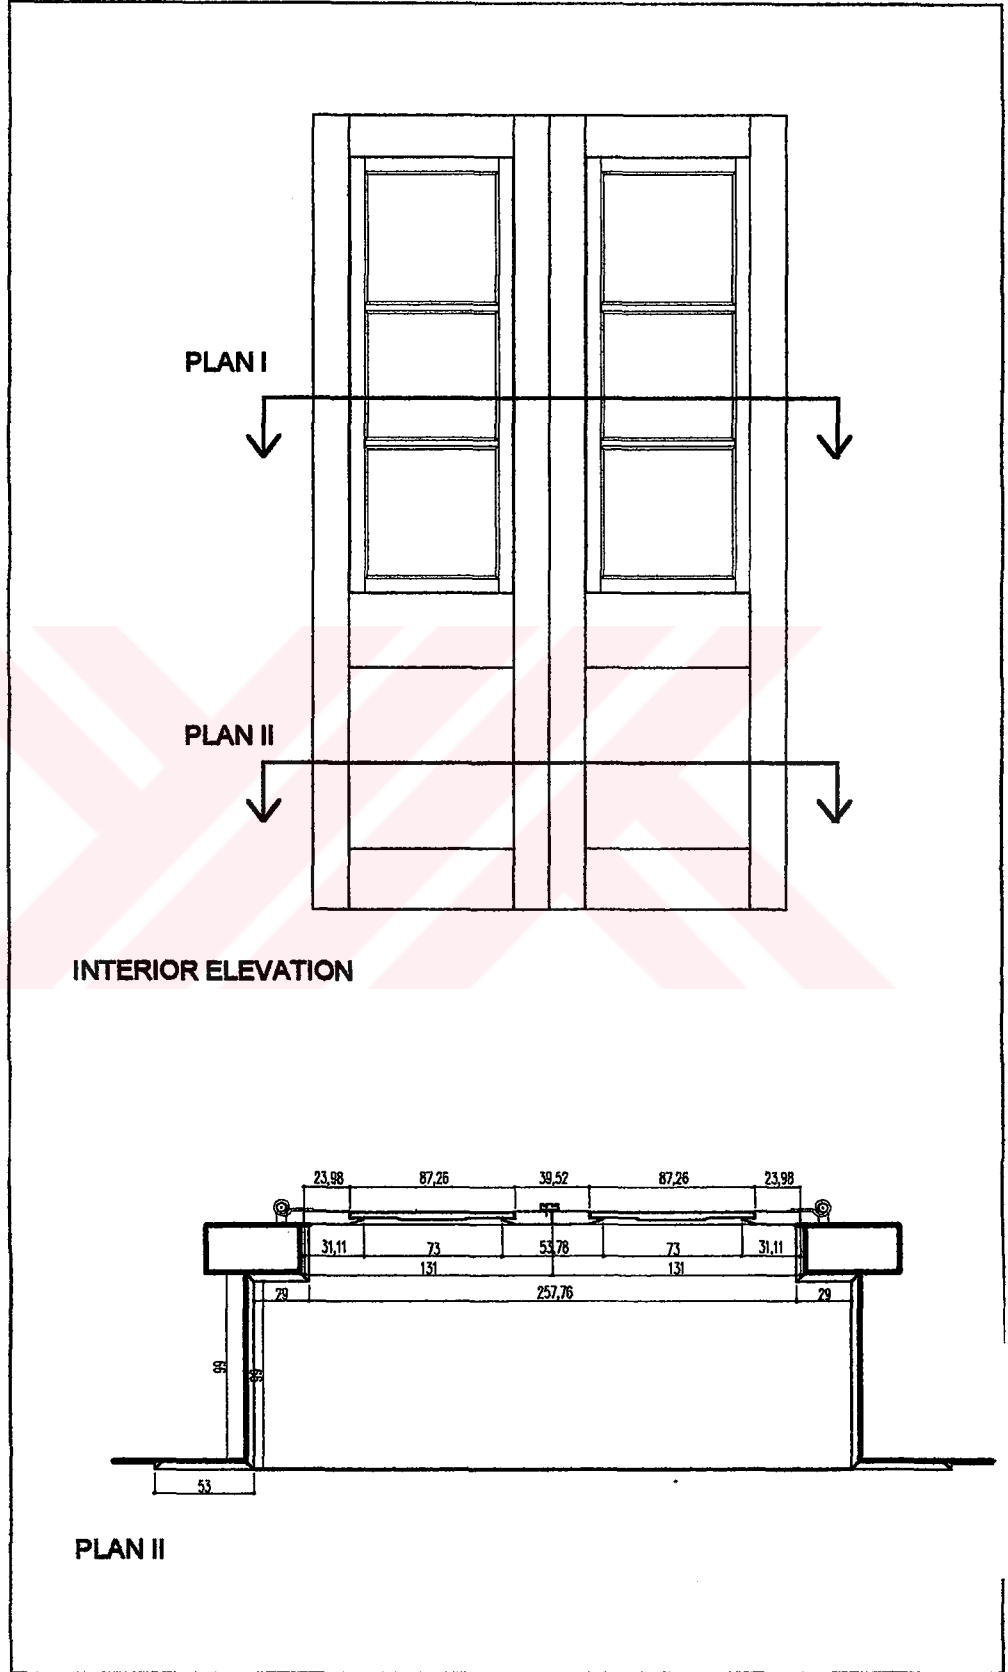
DW04A İzmir Caddesi No:54 - Interior Elevation and Plan
